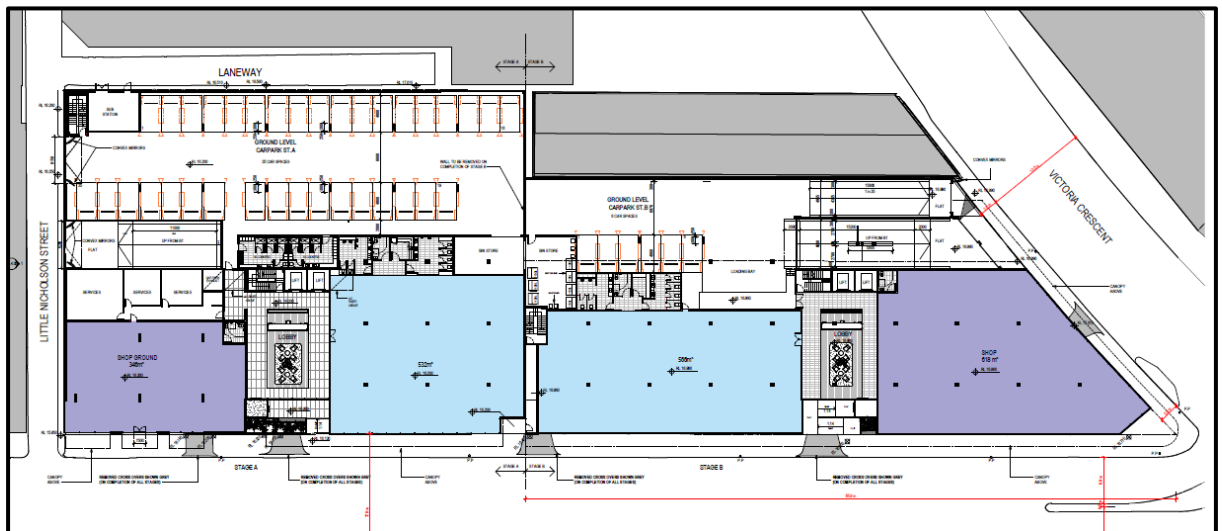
32 – 68 Mollison St – Ground Floor Plan
